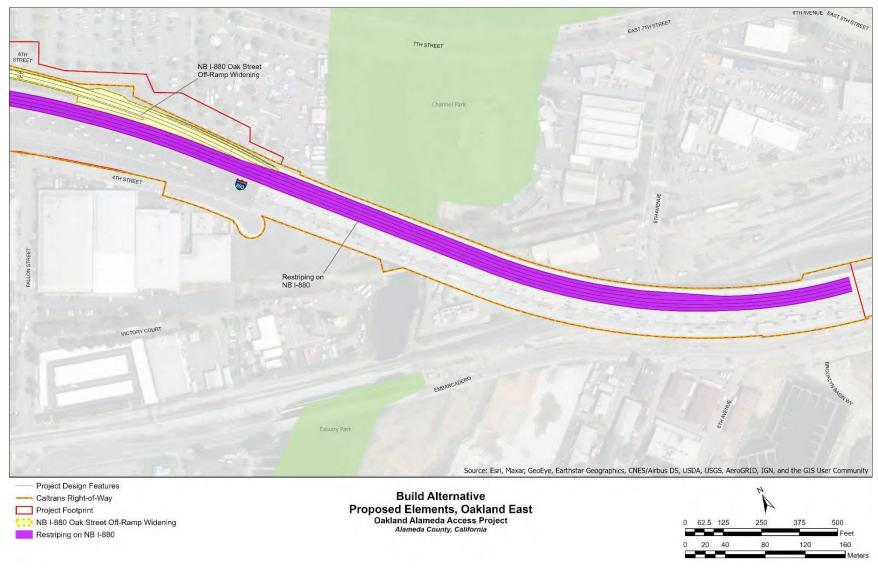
Build Alternative Proposed Elements, Oakland East.
